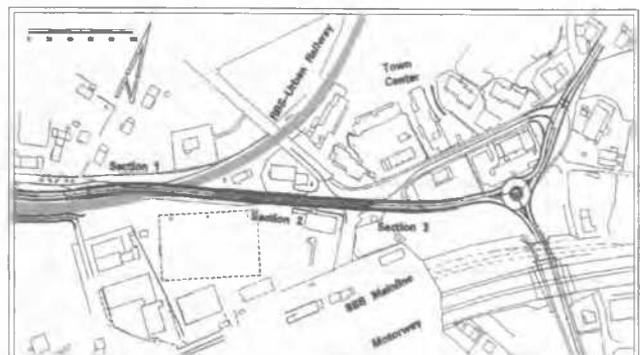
Situation with tunnel and double track urban railway, showing main sections of the tunnel and new road alignment
